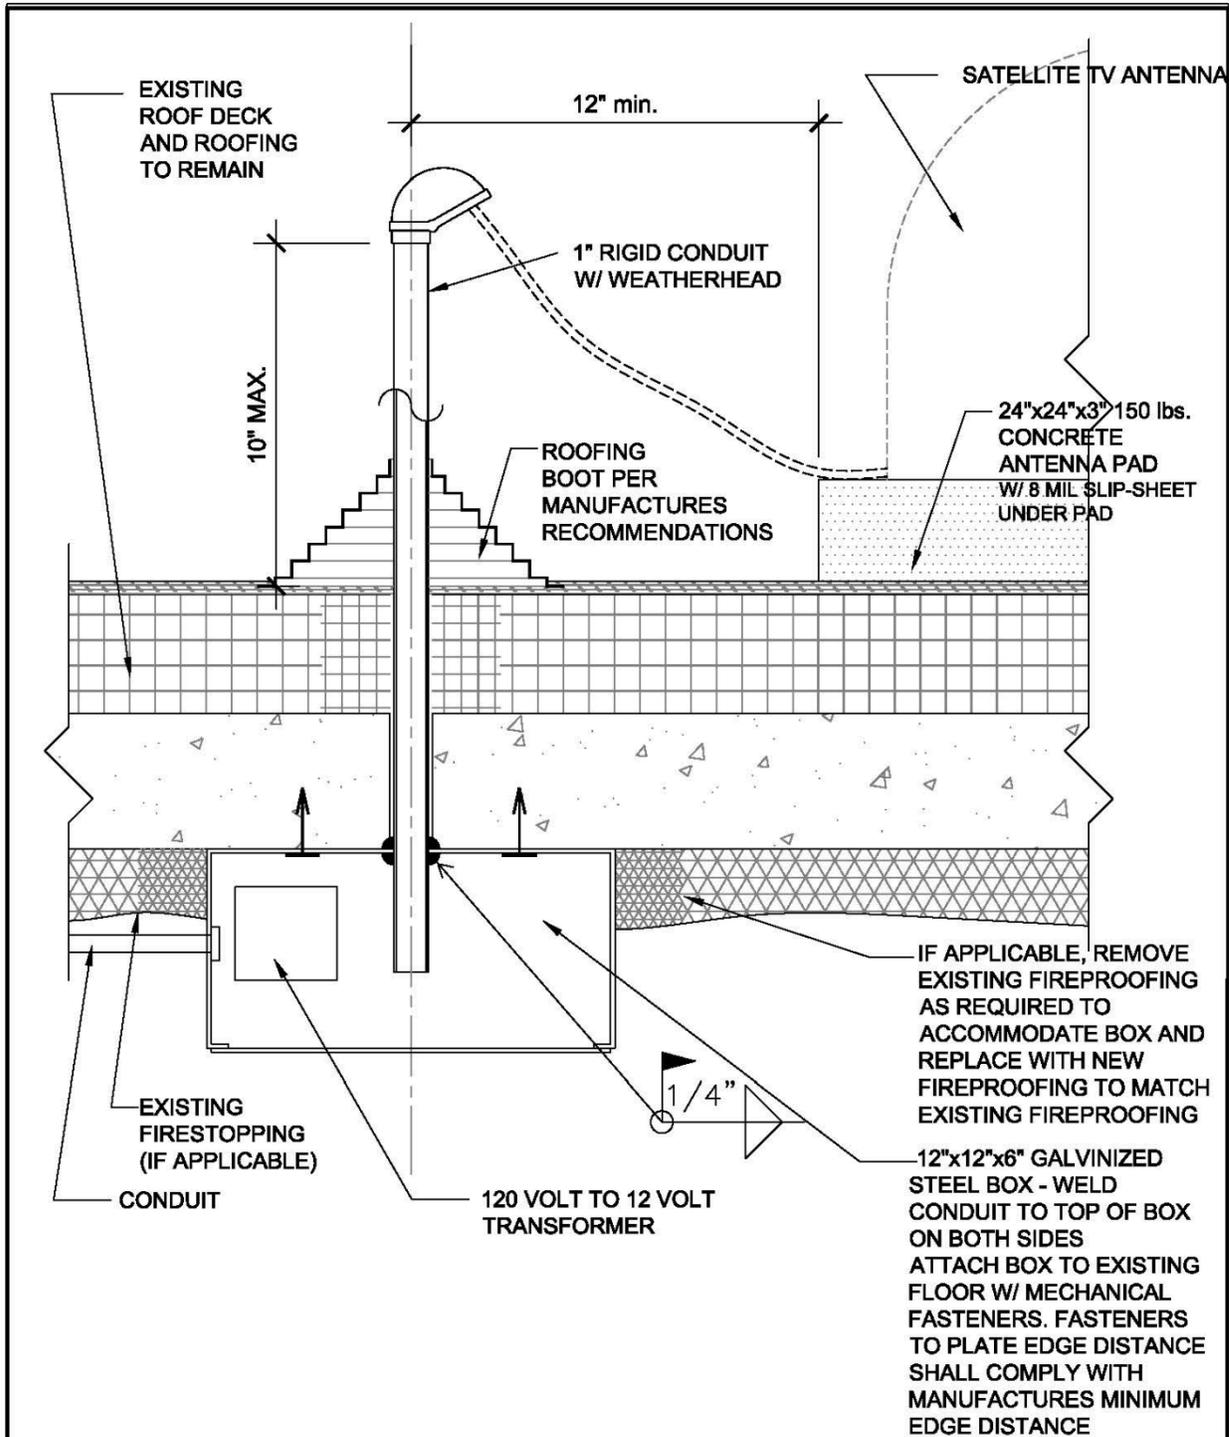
Pipe Thru Roofing System Over Conc. Slab
